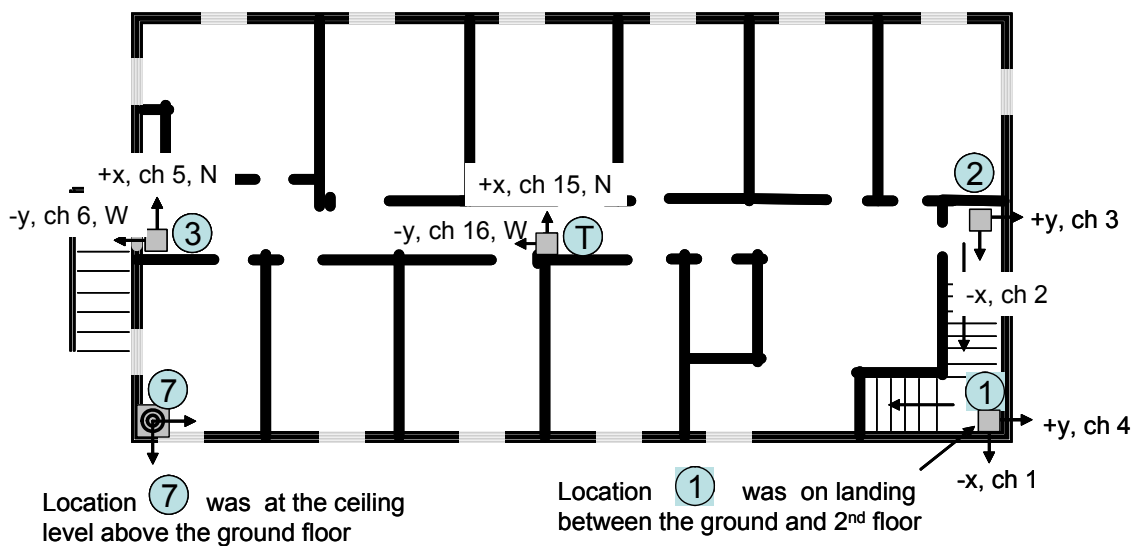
Plan Schematic Showing Numbered Locations and Orientations of Accelerometers for the Second Floor Level
